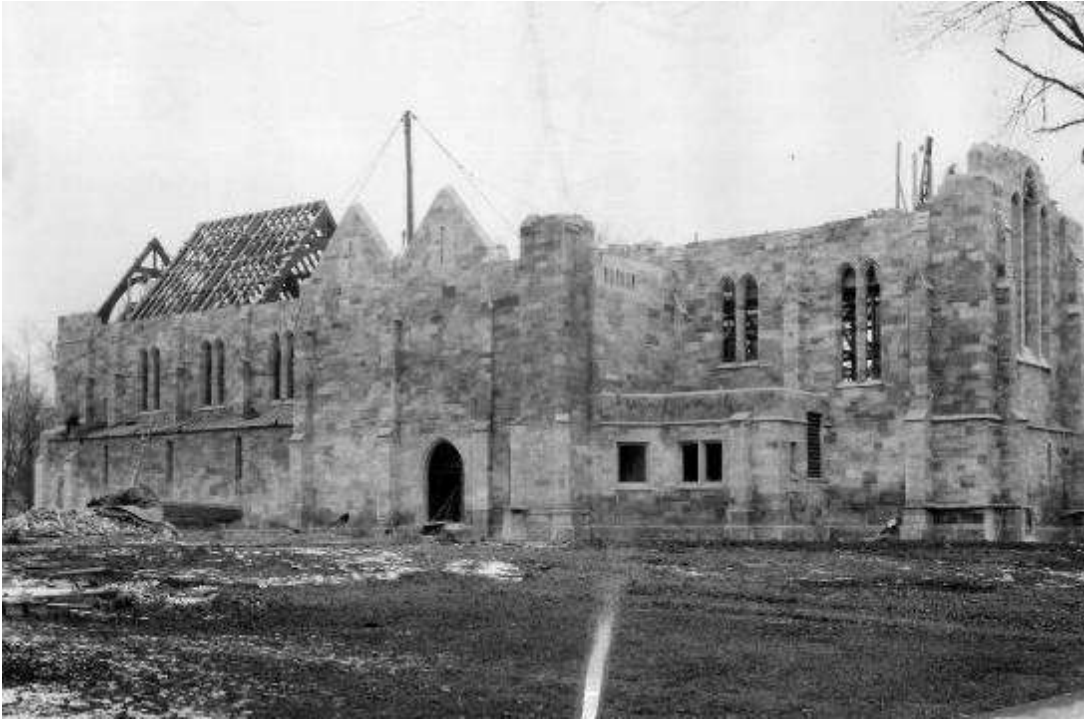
View of the south façade from the southeast showing roof trusses, December 1925
